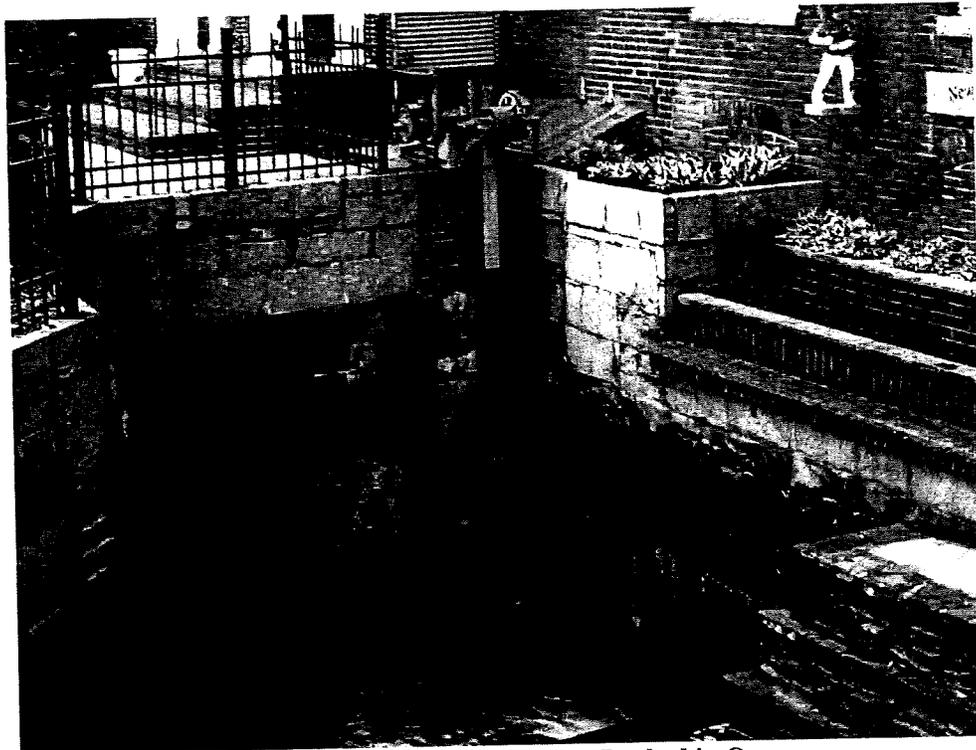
Downstream of Spillway Viewed from Right Abutment
